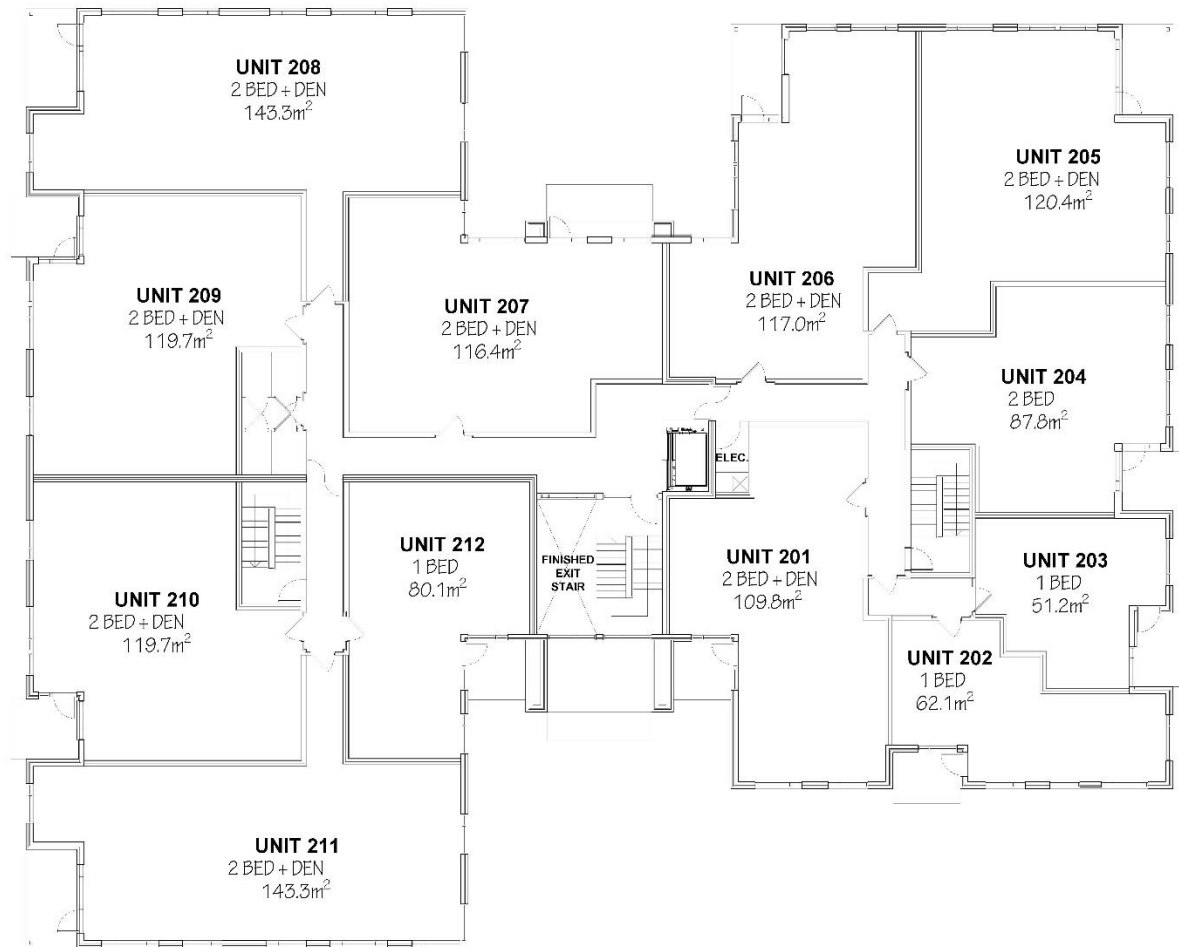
Second Floor Plan (Source: Hobin Architecture).
